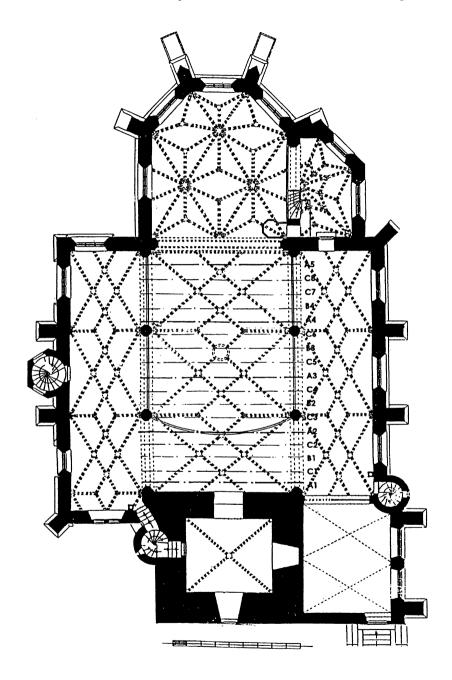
Ground-plan with principal rafters A1-A5 [1]
